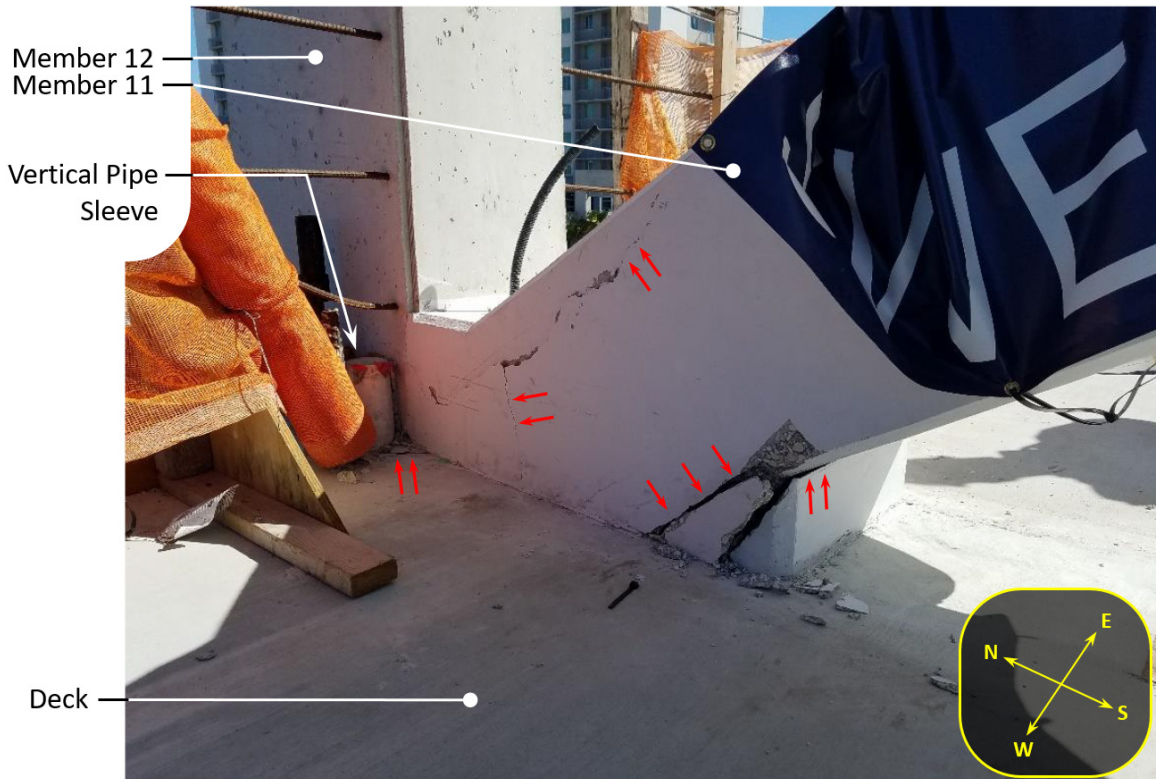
Photograph showing the west face of truss member 11 where it met the deck on March 15, 2018 at 10:55 a.m. Corresponds to Bridge Factors Factual Report Photo 103.
